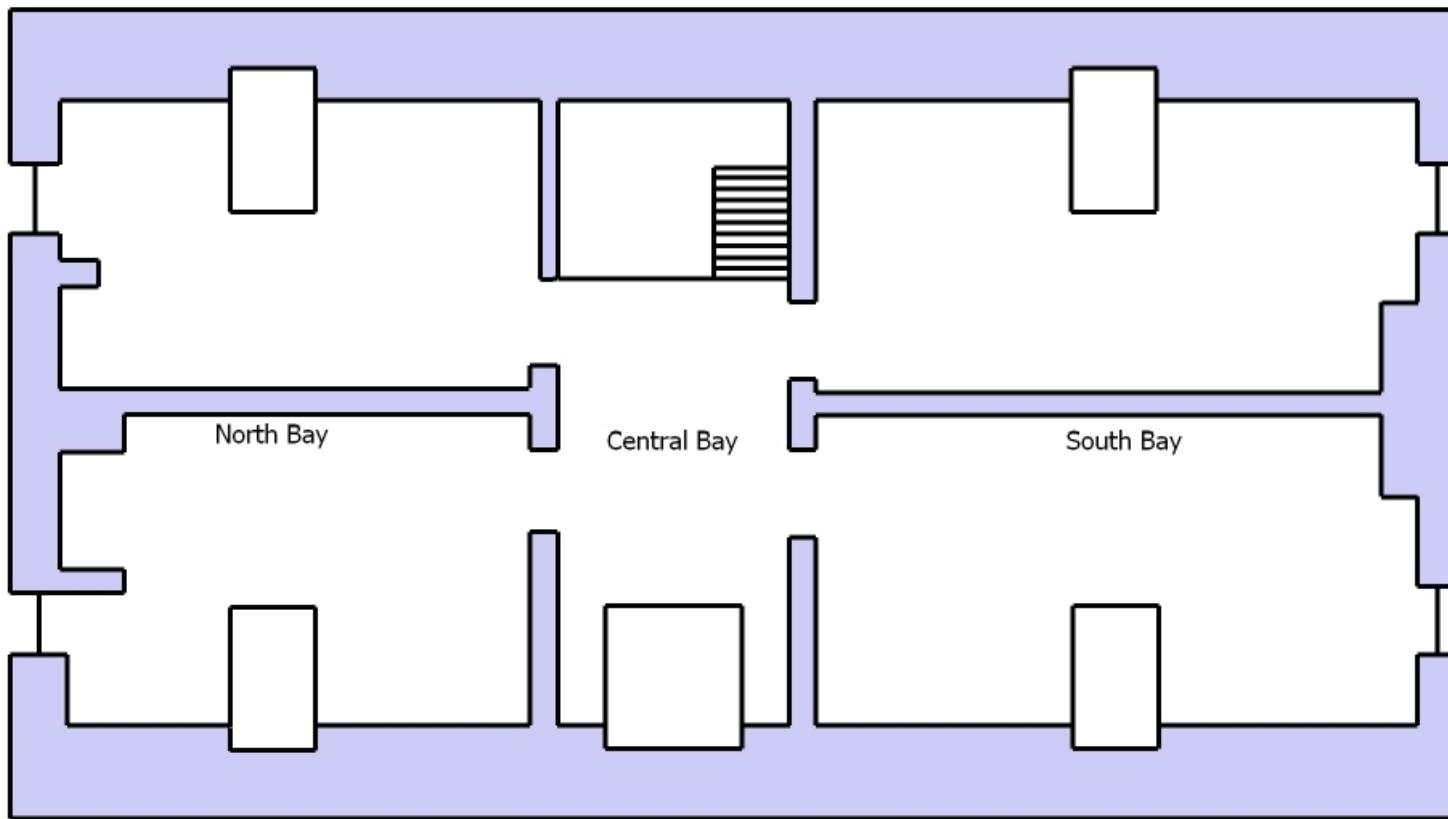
Plan of Bostwick's attic floor. Drawing by Kathleen Manicke.
